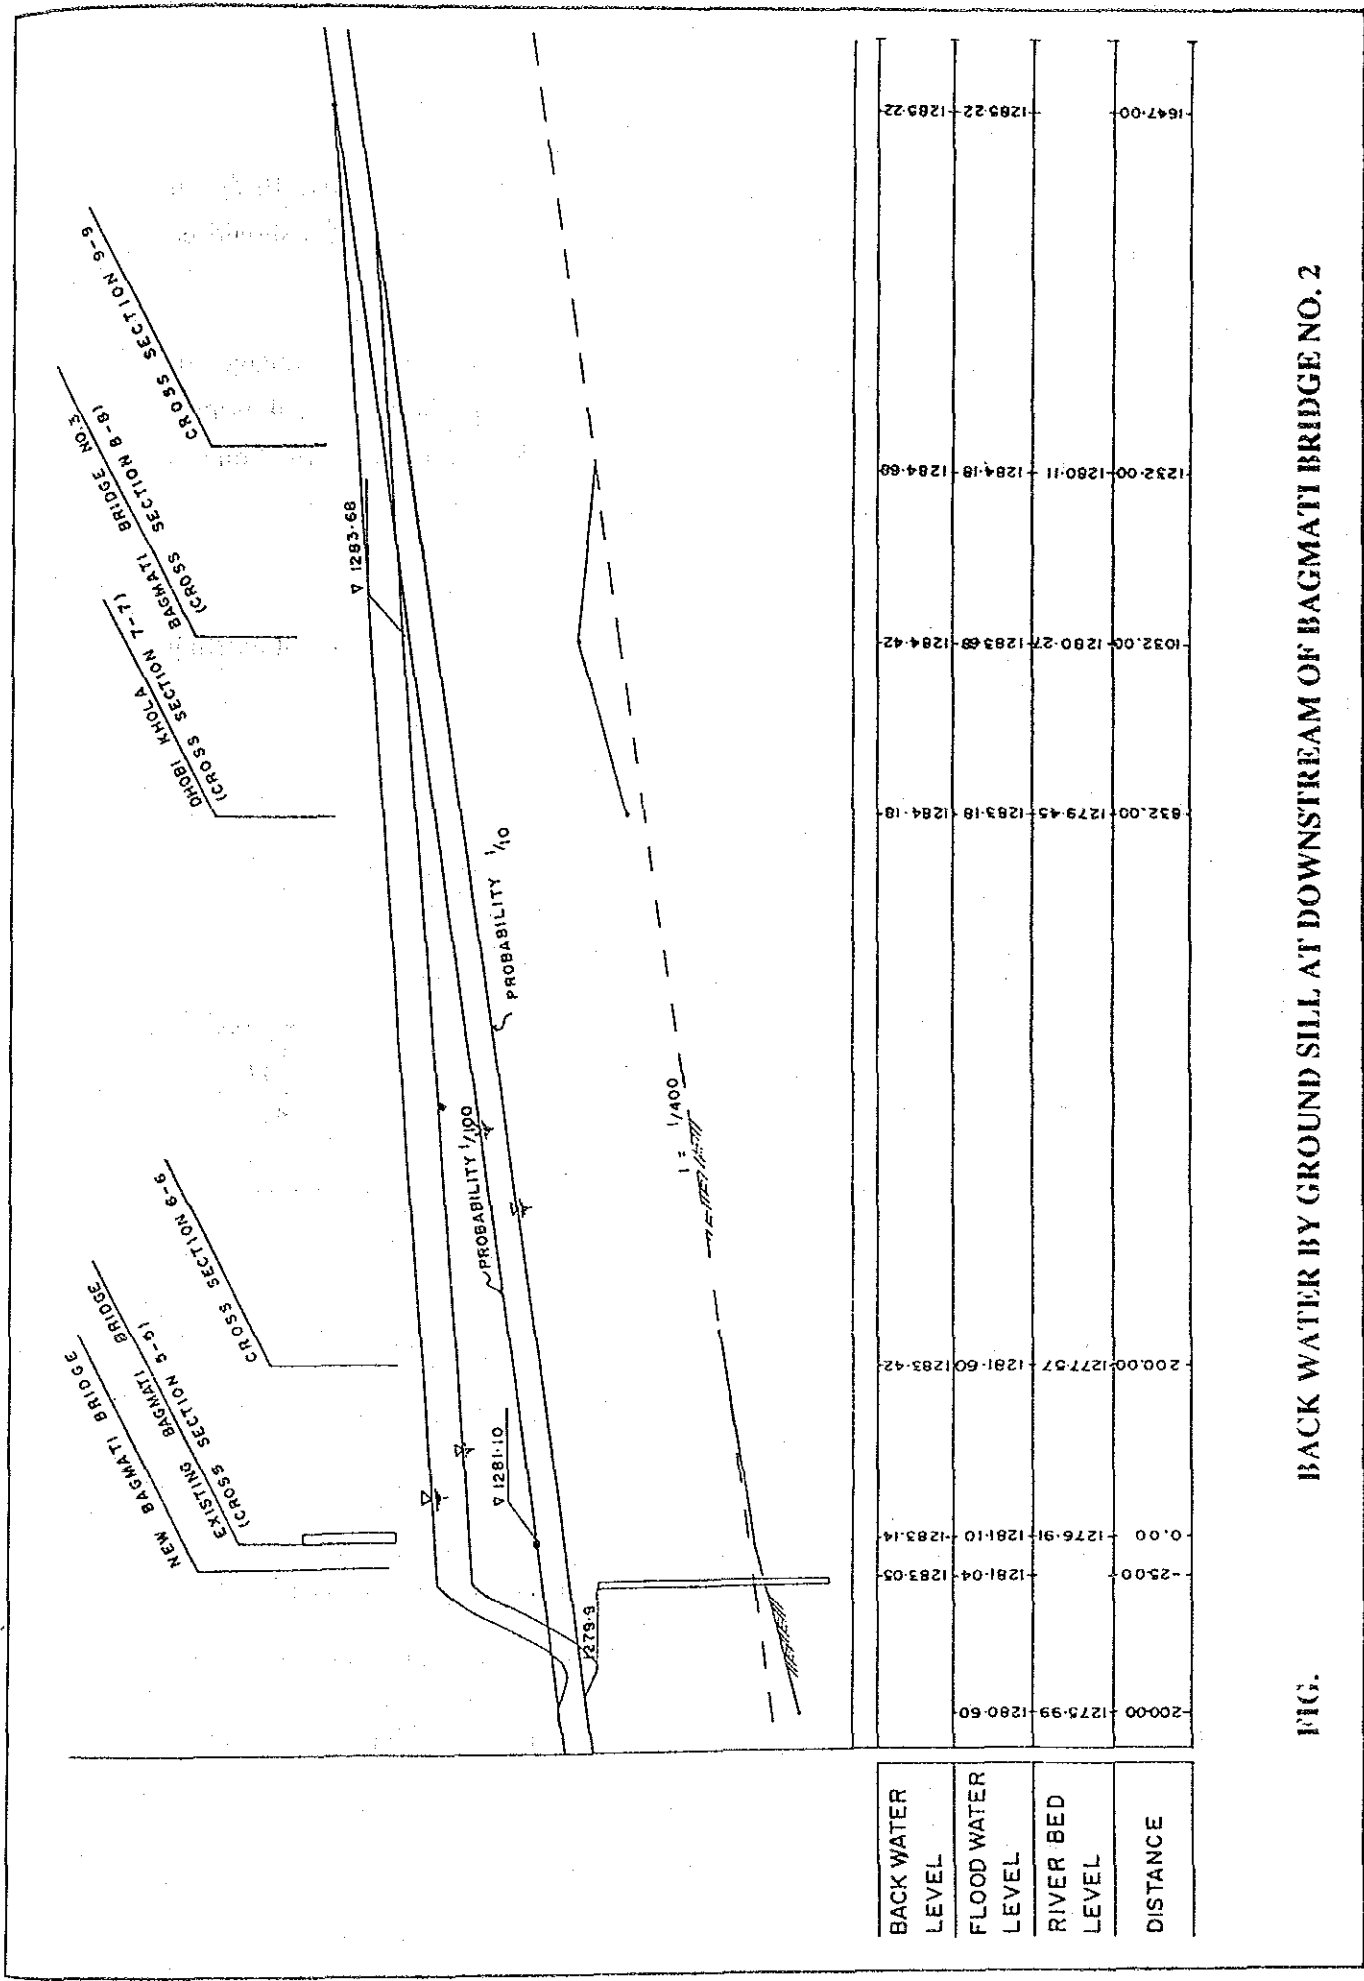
FIG. BACK WATER BY GROUND SILL AT DOWNSTREAM OF BAGMATI BRIDGE NO. 2
